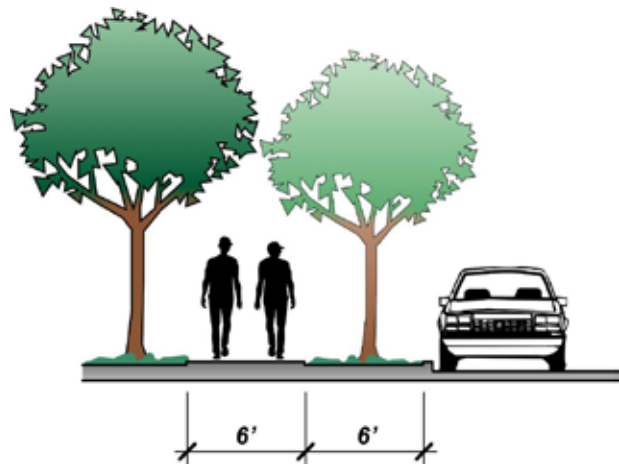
Typical sidewalk treatment for major collectors.
